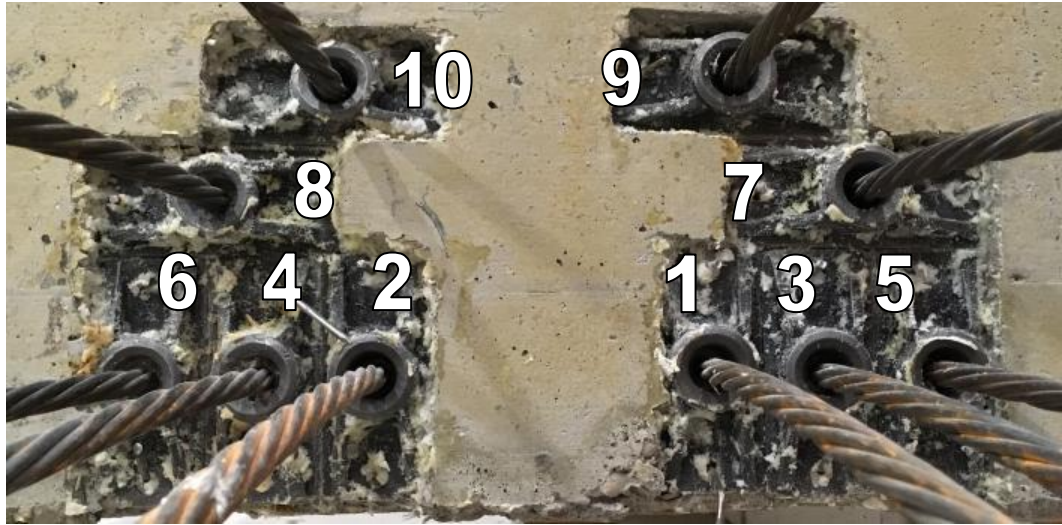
Anchor Plates After Casting the South End Repair
